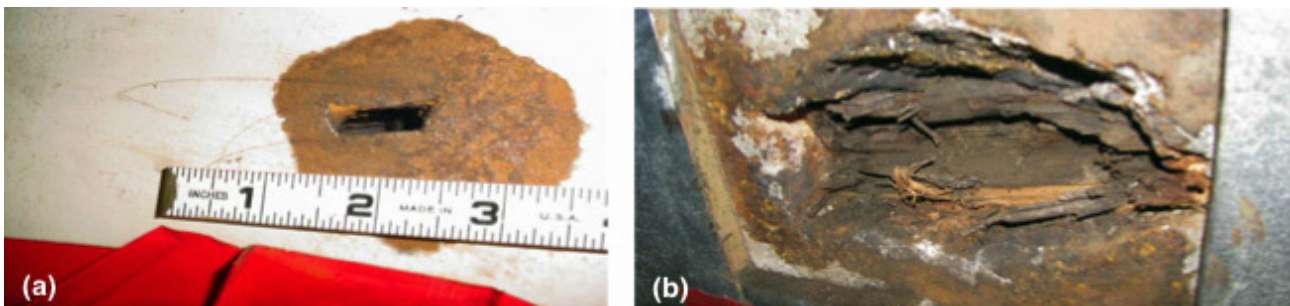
Examples of corrosion originating from the concrete side of the liner: (a) paint blister; (b) wood embedded in concrete after a section of liner was removed [158].
